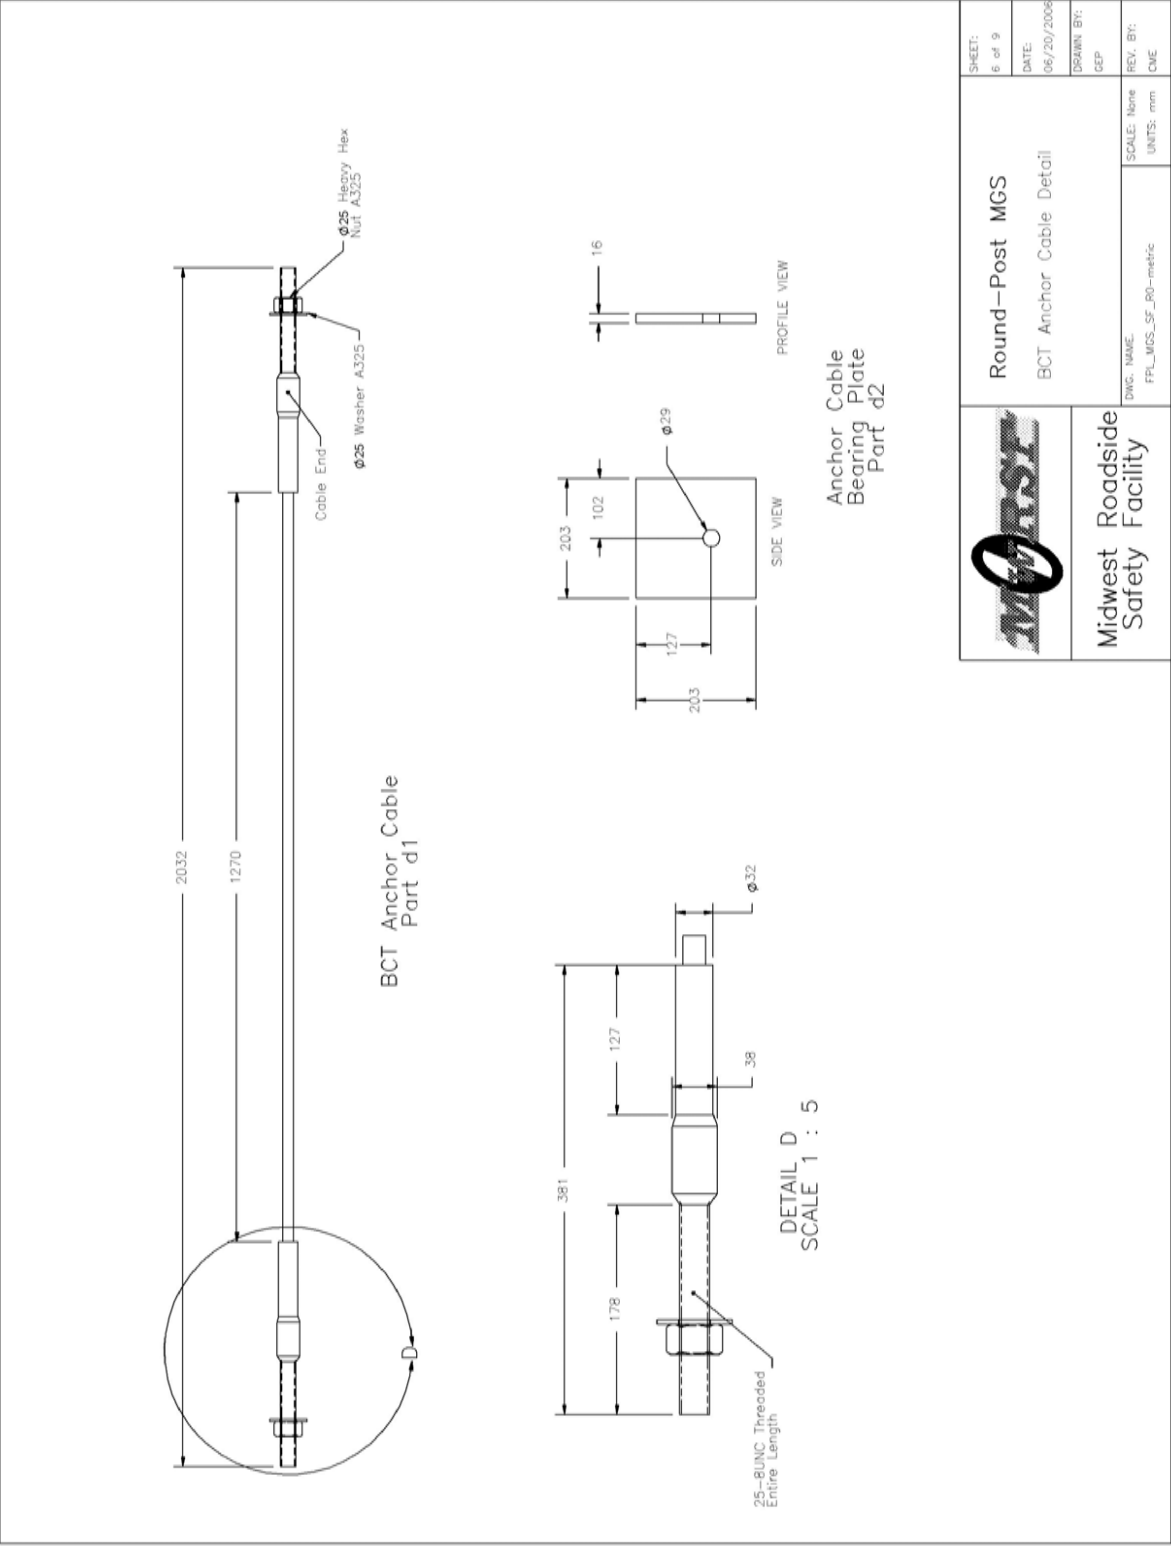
MGS Round Post Southern Yellow Pine Details – BCT Anchor Cable Detail
